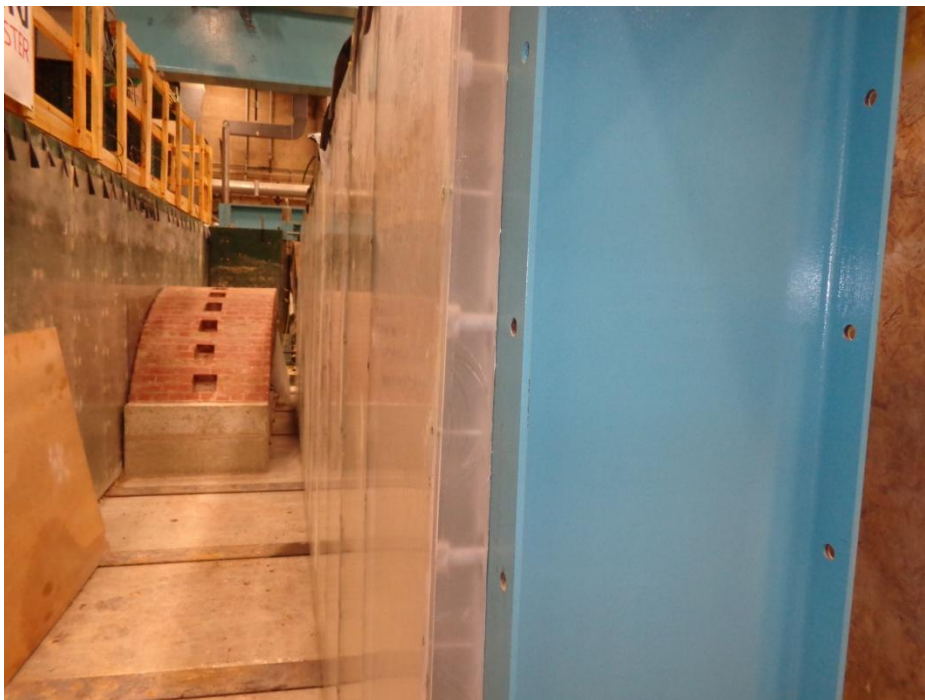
Transparent Perspex slabs forming stiff, smooth plane lining of chamber, steel ties for lateral restraint of chamber walls visible on floor
